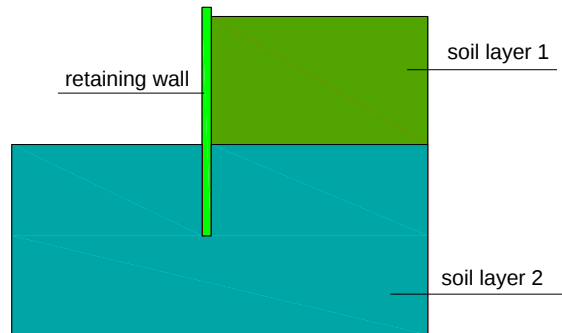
A typical problem in geotechnical engineering-retaining wall analysis
